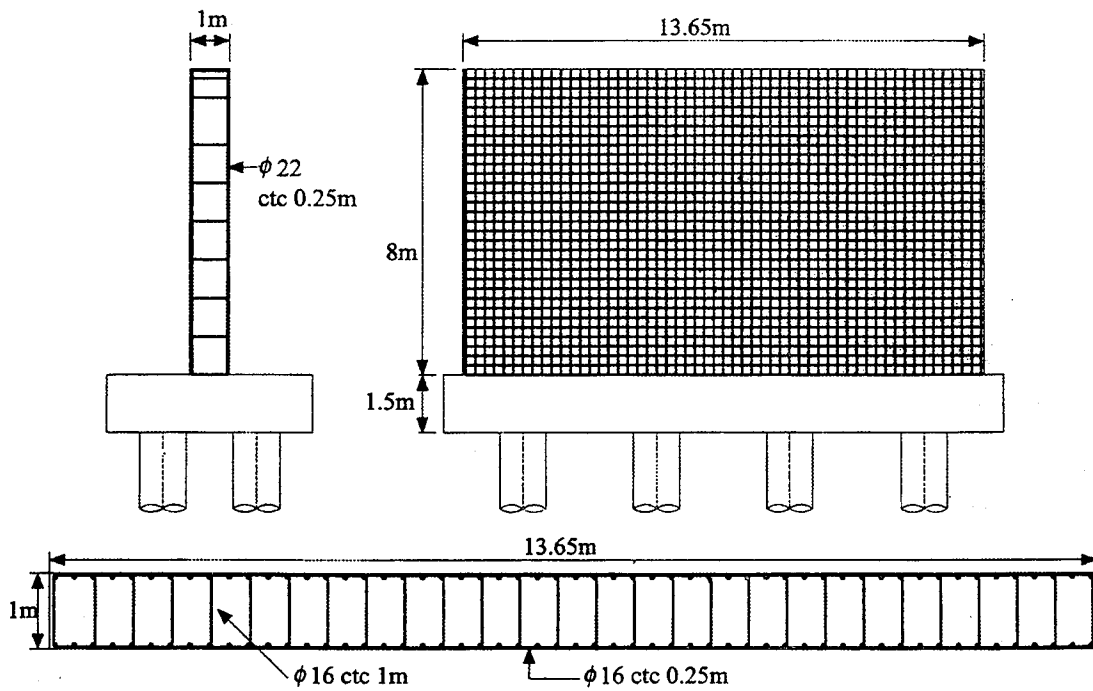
Section of Piers, Arifiye Overpass (Courtesy of F. Inal and H. Hoashi)
